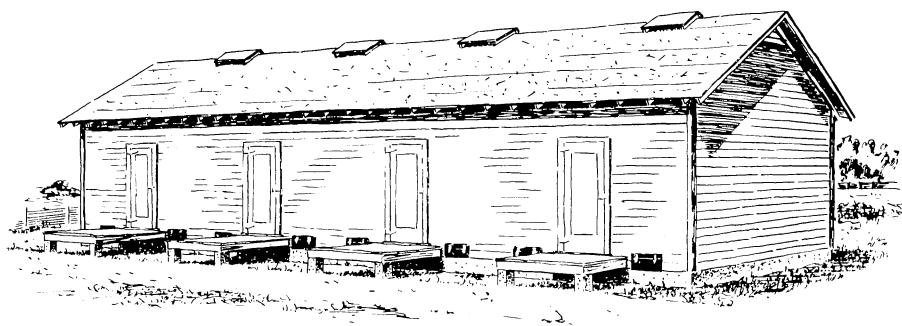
A 4,000-bushel sweetpotato storage house. (Exchange Plan No. 5648.) Note recommended location of strip heaters for electric heating.
